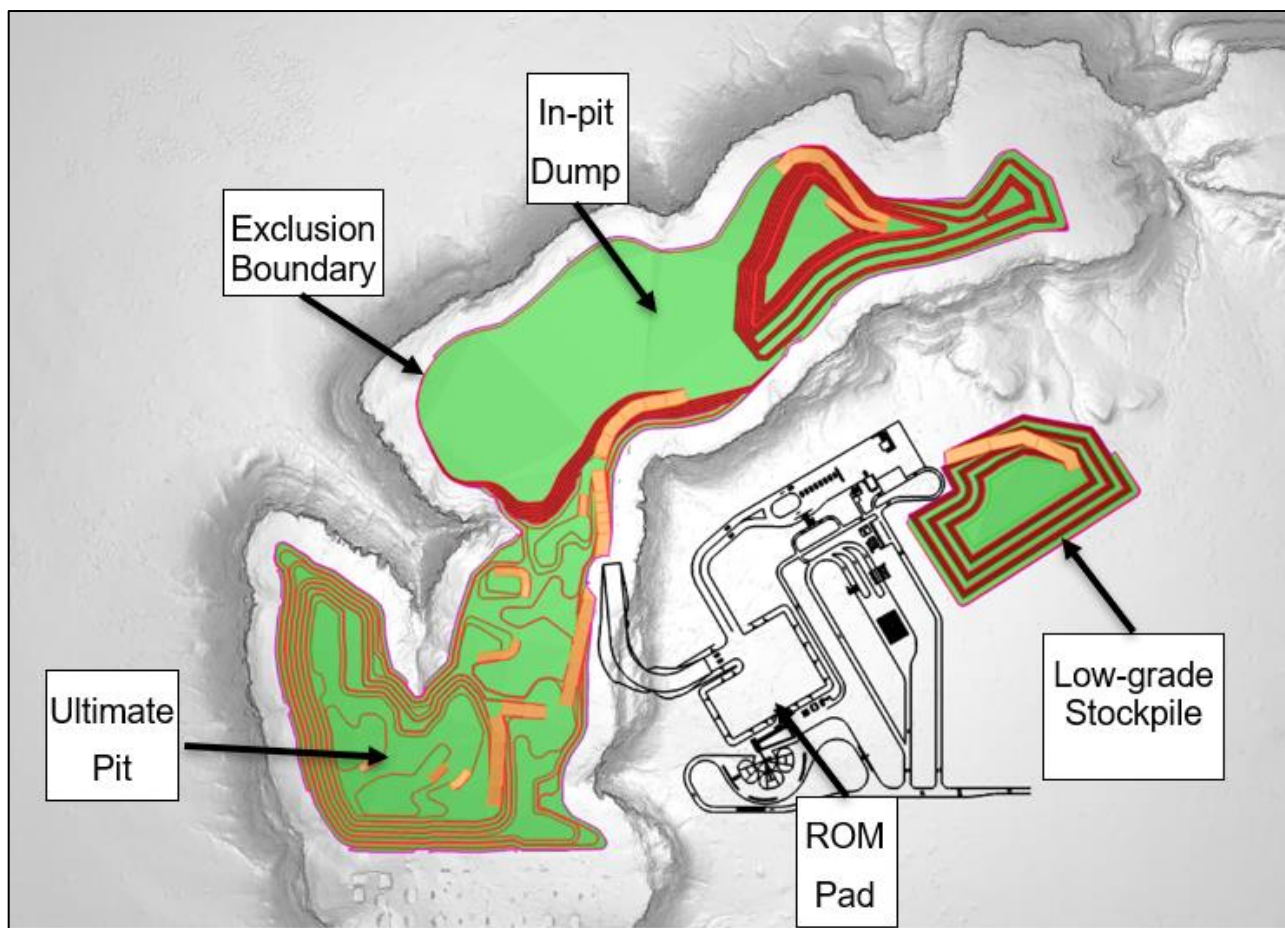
Plan view - Robe Mesa 2023 indicative mine site and infrastructure layout
